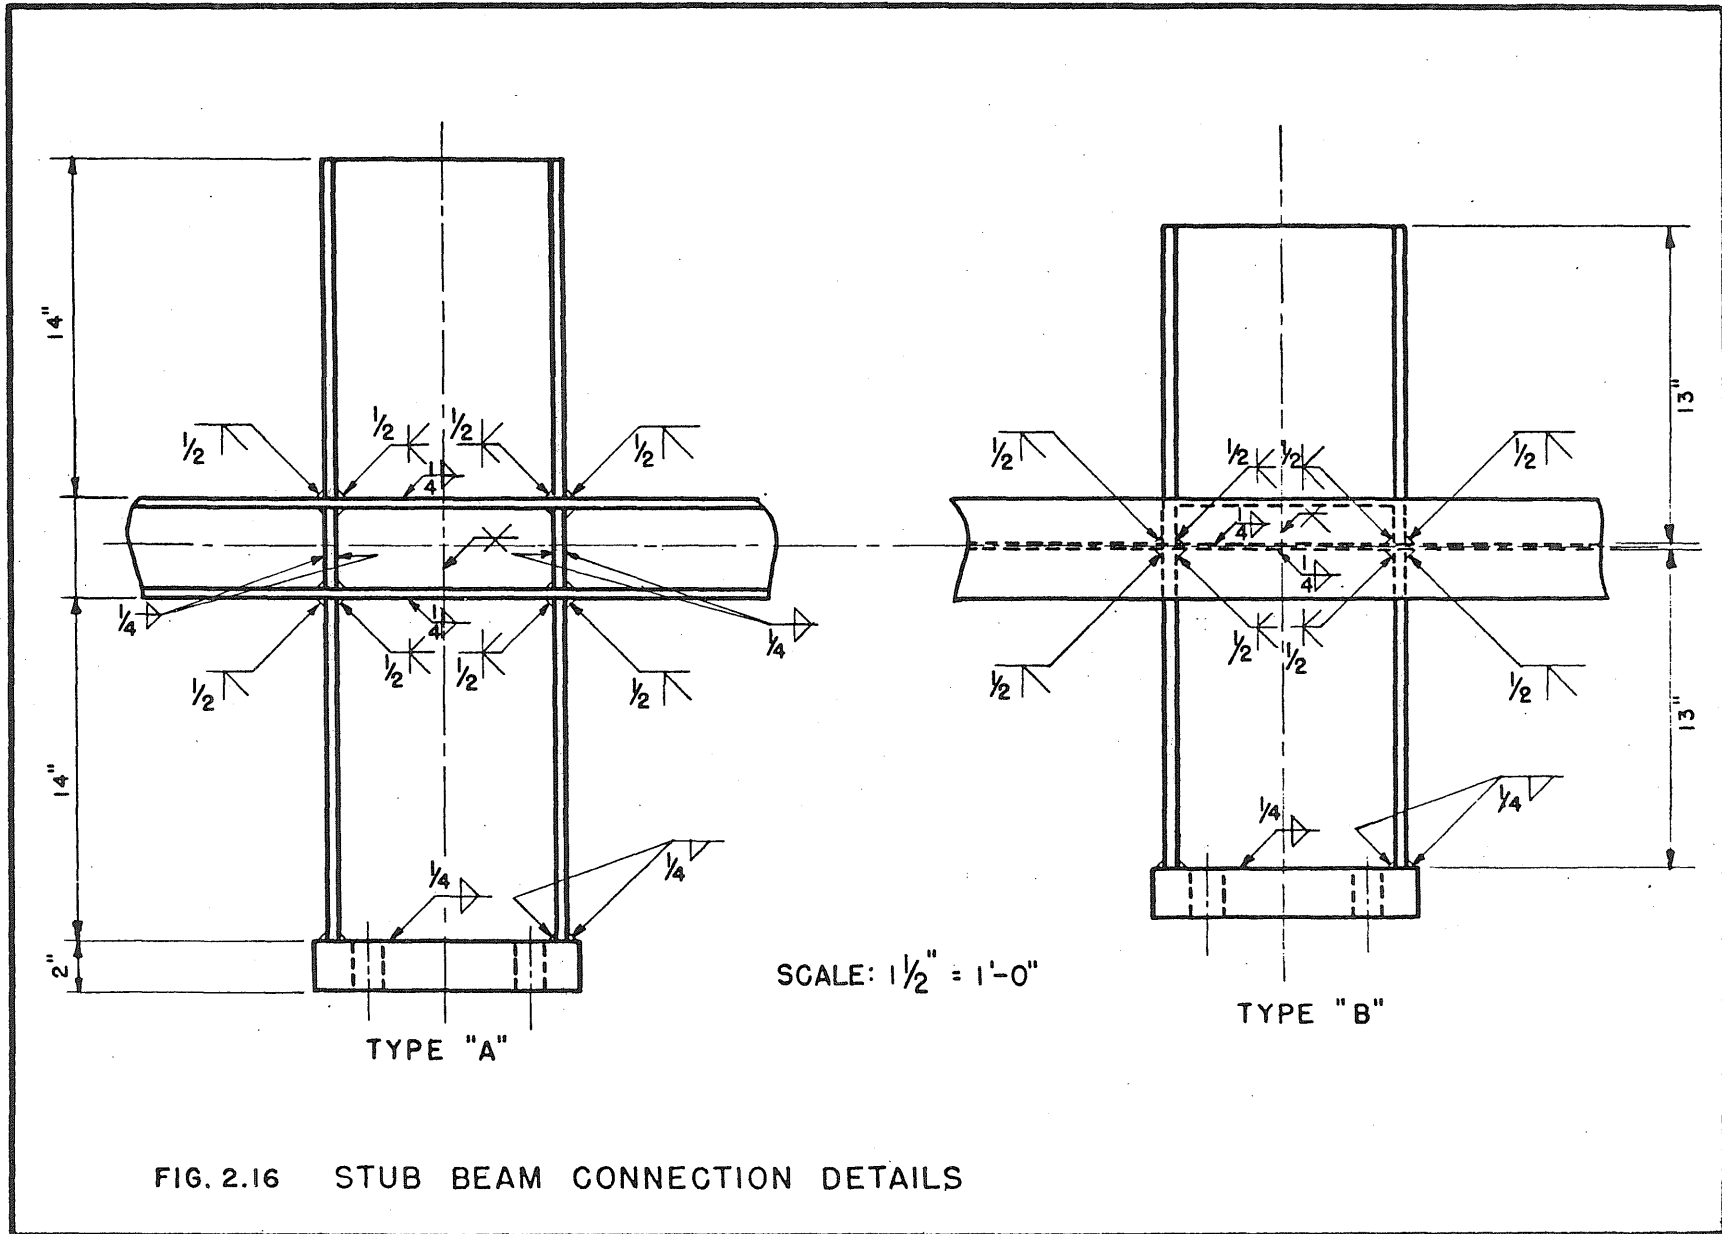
STUB BEAM CONNECTION DETAILS
